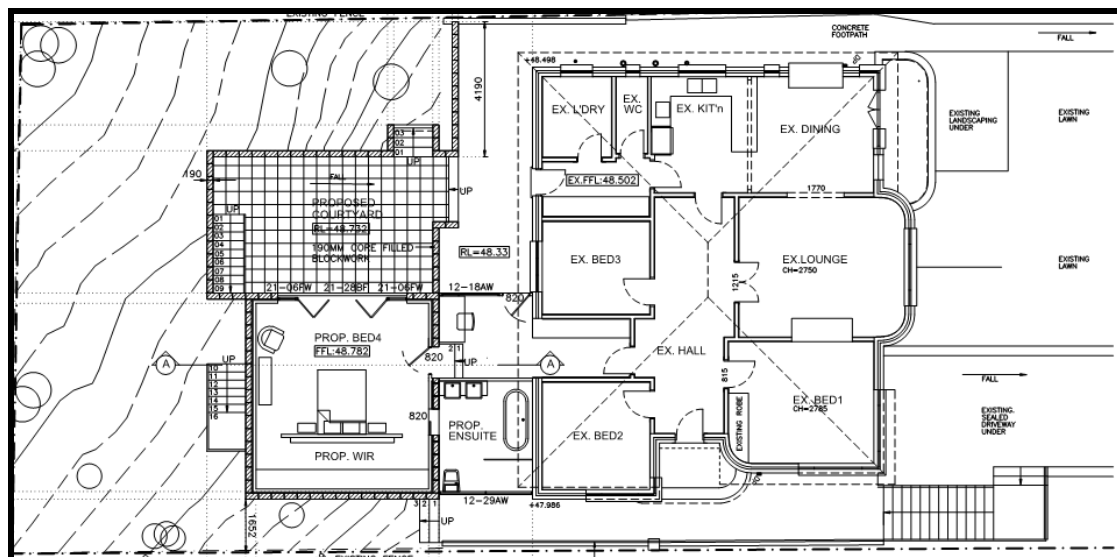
A snapshot of the layout of the proposal, showing access to the private outdoor space via a study and hall way.
